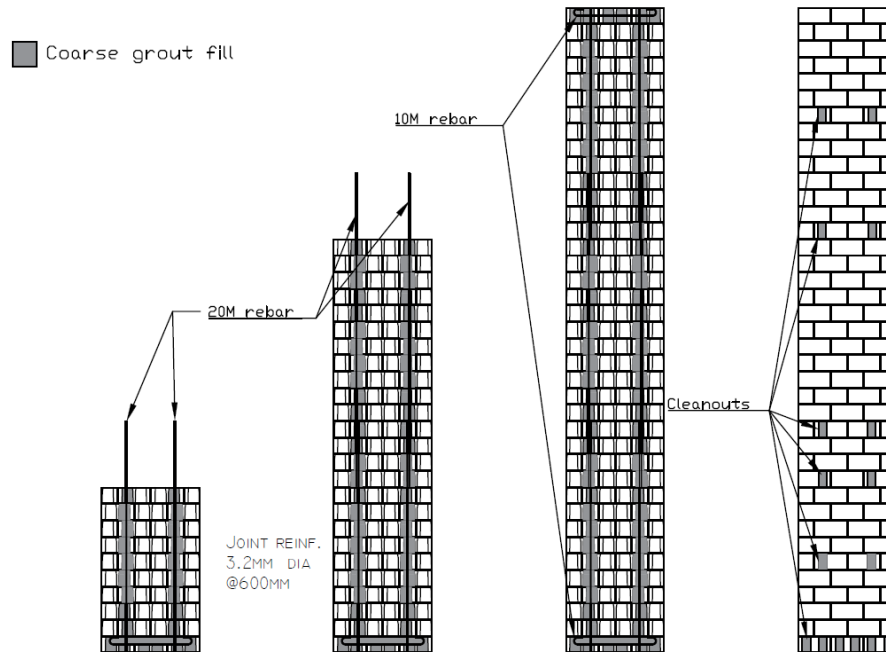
Staging for the placement of reinforcement for Walls CH7800a and CH7800b
